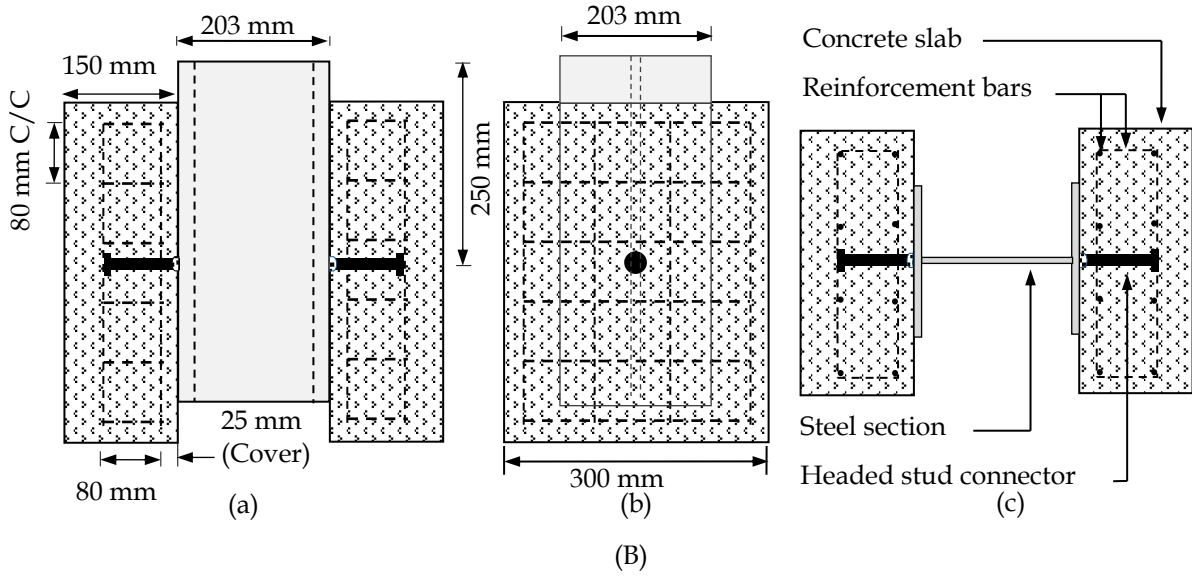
(B): Steel-concrete composite specimen with 80 mm double reinforcement layer cage at 25 mm from root of stud; (a) front view, (b) side view and (c) top view
